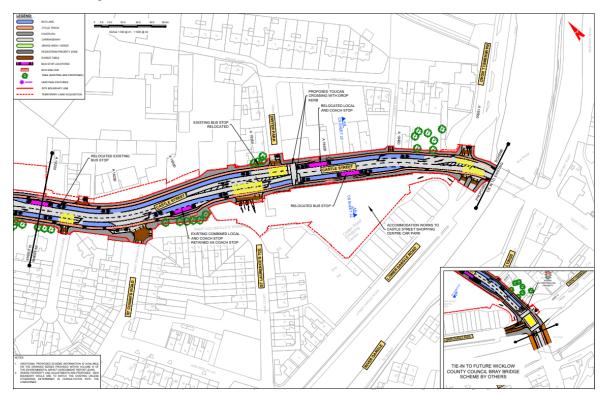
Extract from General Arrangement at Castle Street (Sheet 55)
